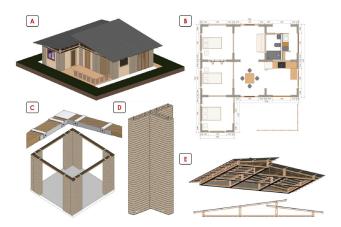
Adaptable modular structural system with 3D printing for rural housing in the Department of Cauca, Colombia: (a) 3D architectural model of the housing prototype, (b) architectural floor plan, (c) PINBOO beams, (d) printed structural walls and (e) bamboo roof structure
